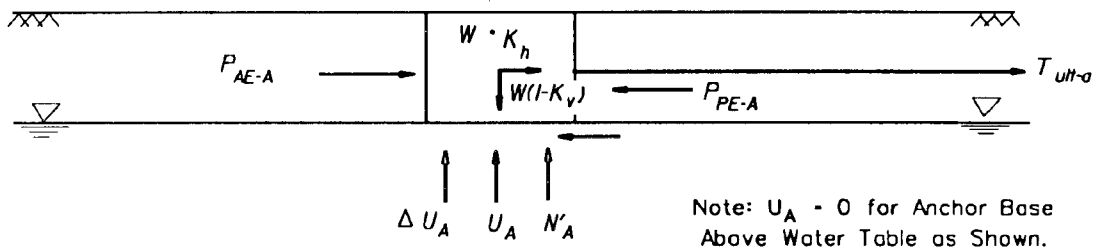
Horizontal pressure components and anchor force acting on sheet pile wall
